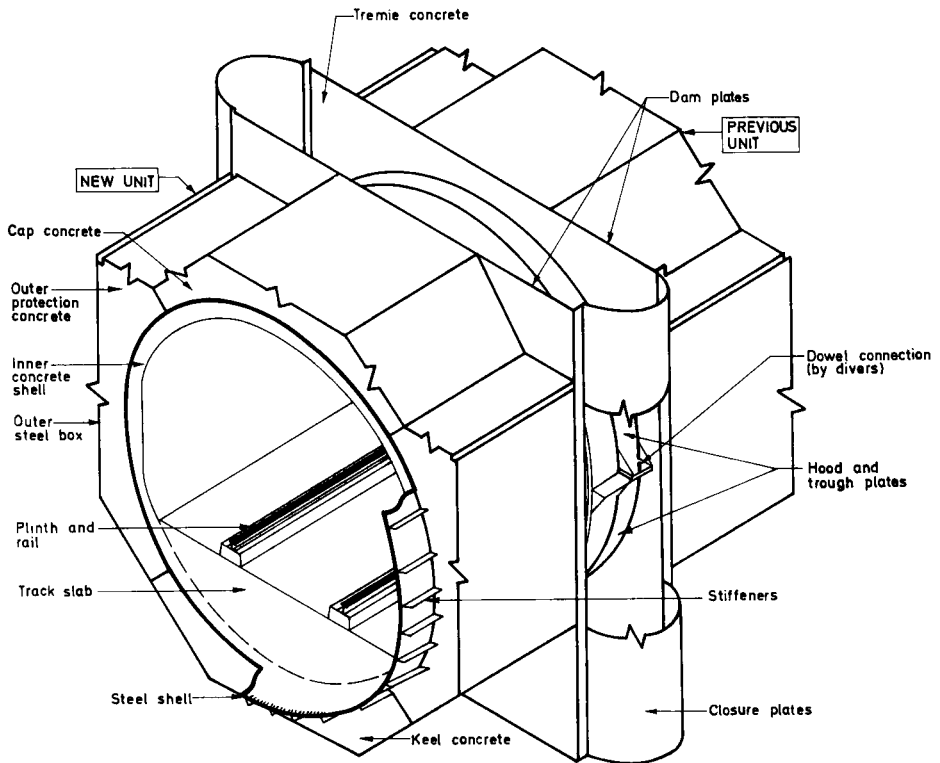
Tremie concrete joint in circular steel shell tunnel
